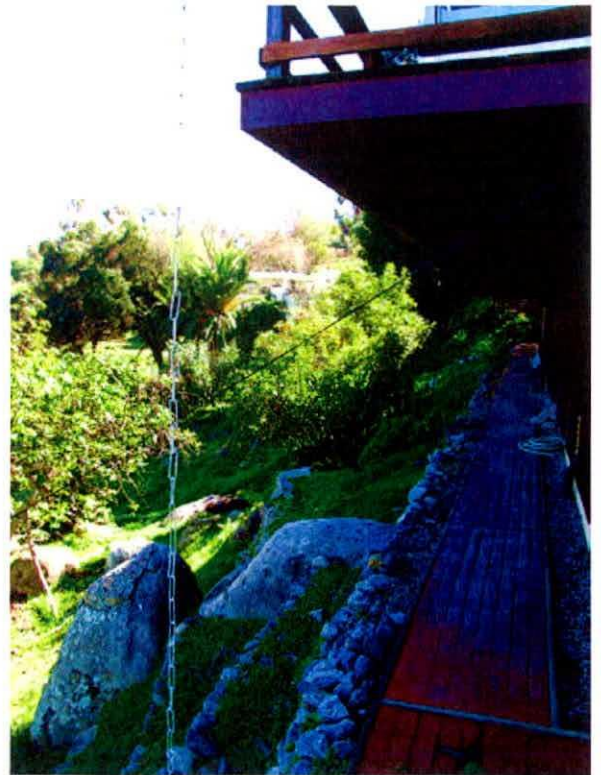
View of the north facade basement level walkway with contributing boulders at the northwest corner of the house in the foreground.
